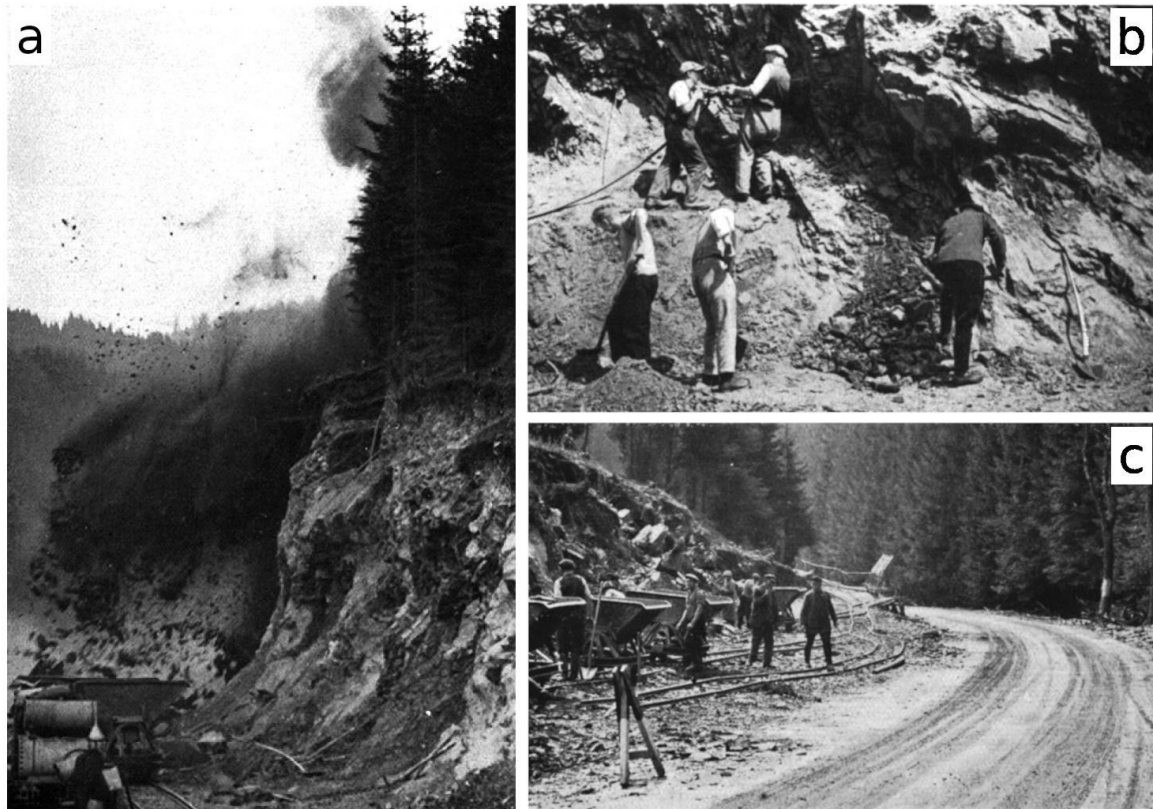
Road Construction in the Harz mountains: road ditches were constructed by rock blasting (a) and removal by hand (b). A leveled road surface was created by using removed material from the inner slope (c). Photos by Sternal, 2021.
